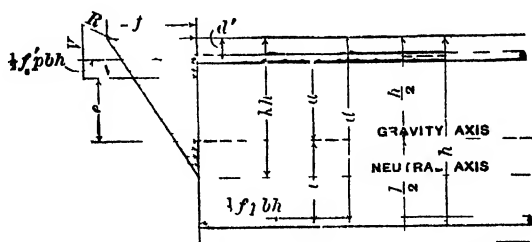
Stresses Caused by a Force Producing Compression and Tension upon a Reinforced Section Tensile Strength of Concrete Neglected (See p 570)
